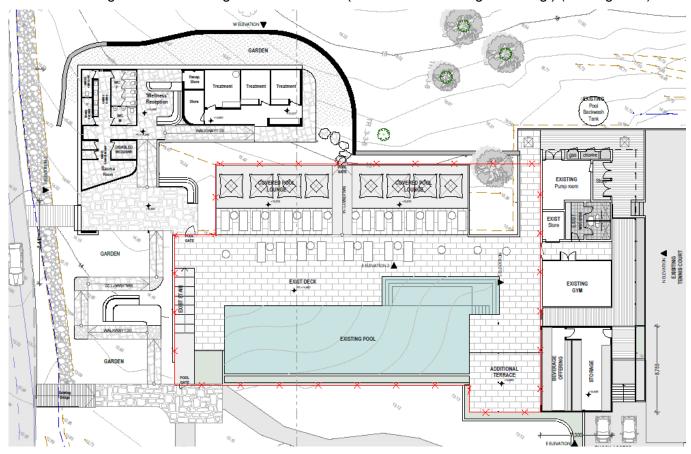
Wellness building (CB.04 - Wellness + Pool Facilities, Revision 14, 29/07/2022).
